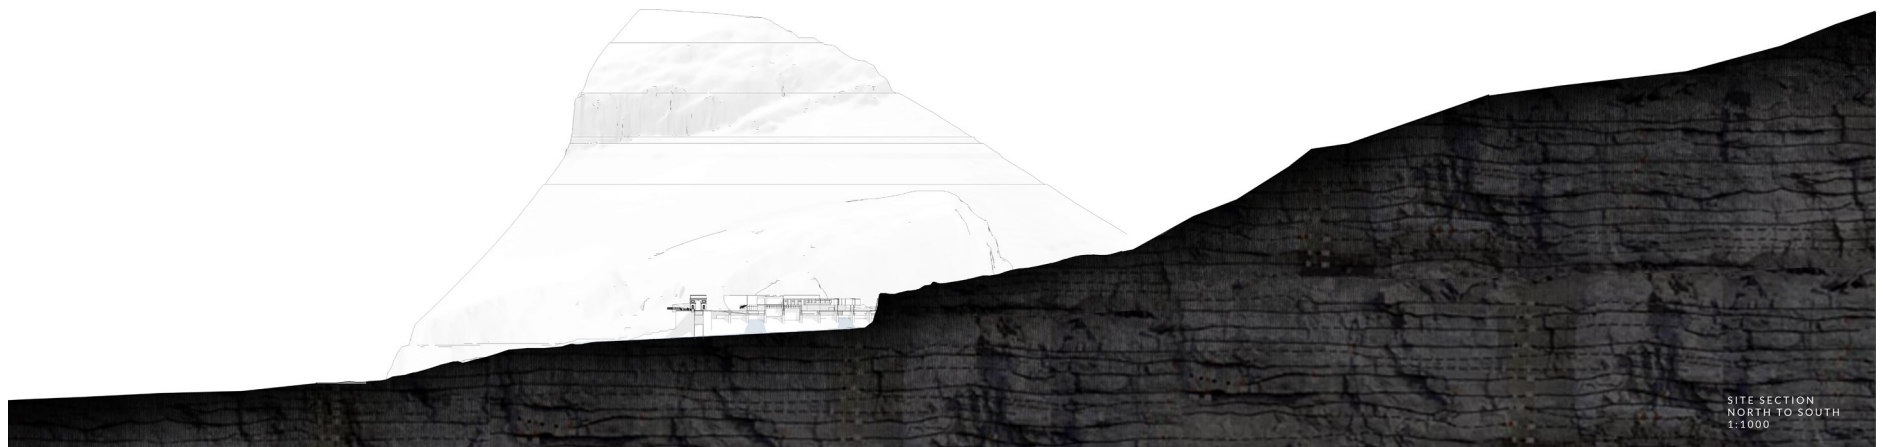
Longitudinal section North to South (Author, June 2016).
